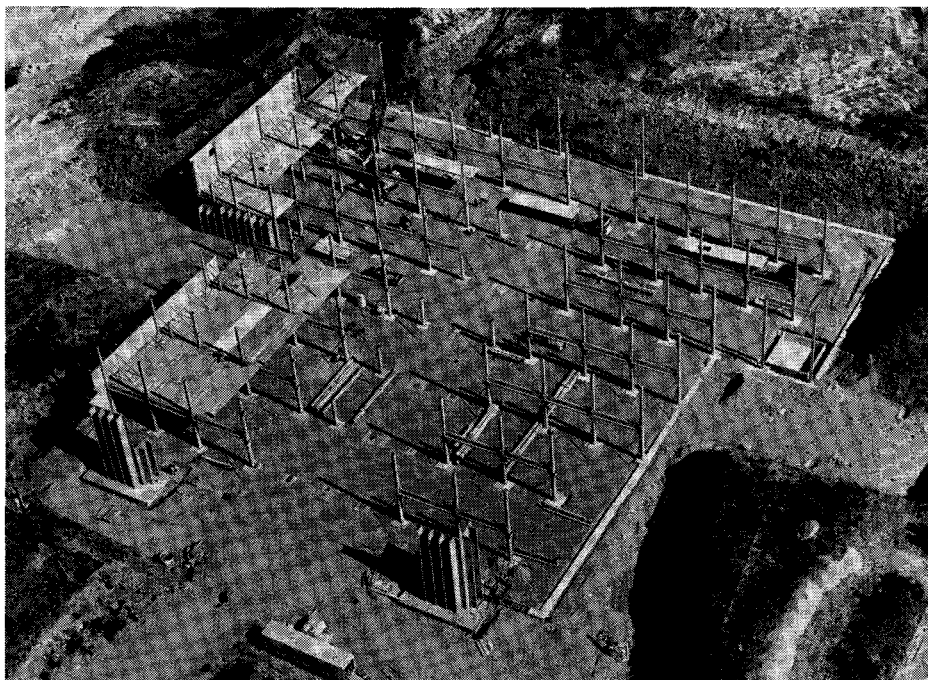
Beginning of construction showing forest of columns with partially erected floor beams and floor slabs. Note stabilizing corner walls.
